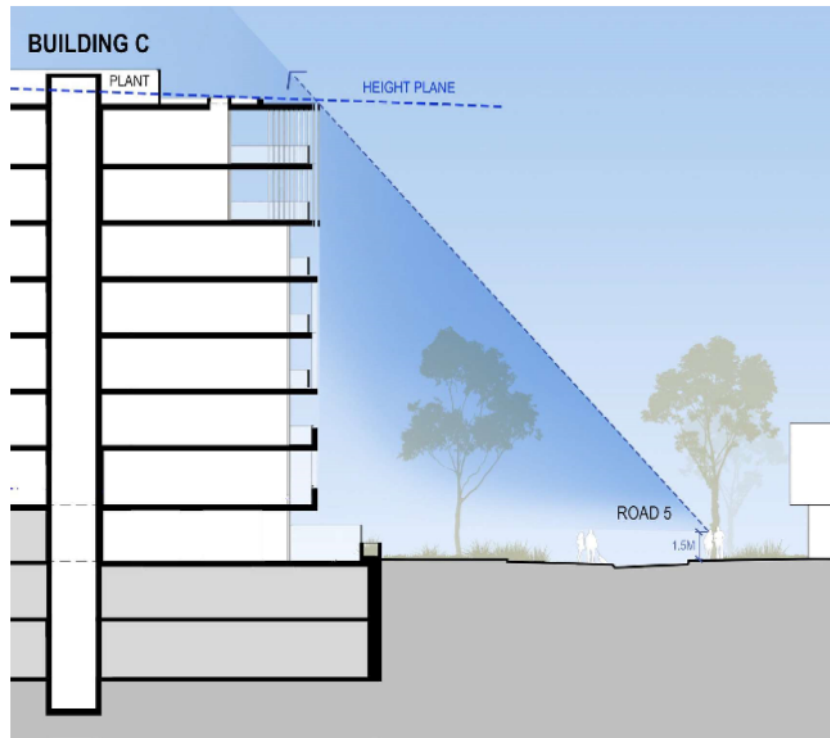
Cone of vision diagram demonstrating the roof plant on Building C being setback and not being visible from Road 5 (Source: Mirvac Design)
